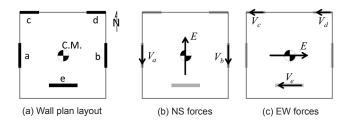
Example plan layout. C.M. refers to center of mass.
